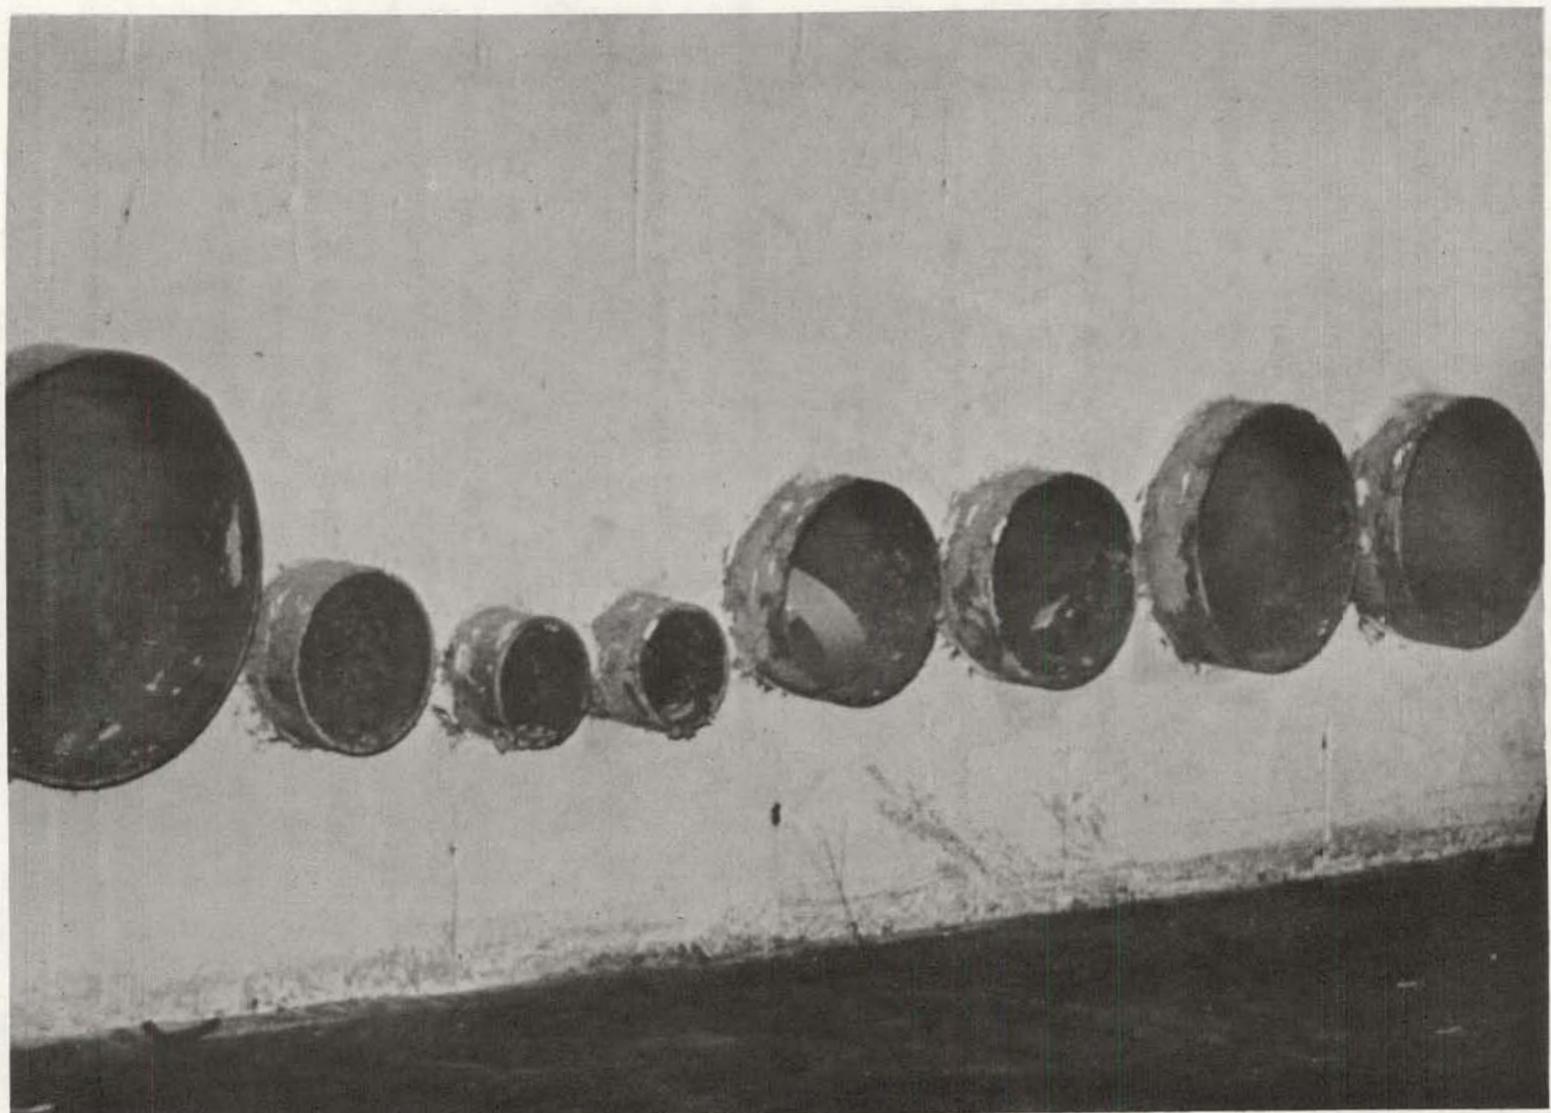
Interconnection Piping Installed in Bleyle Plant
